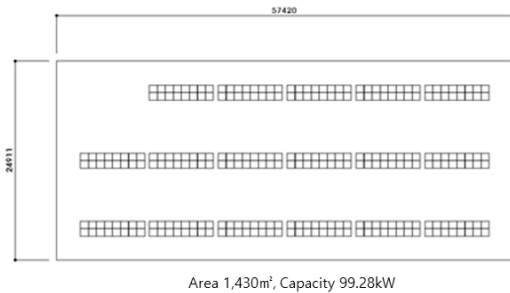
Floor plan of 100kW capacity site in Fig. 15
